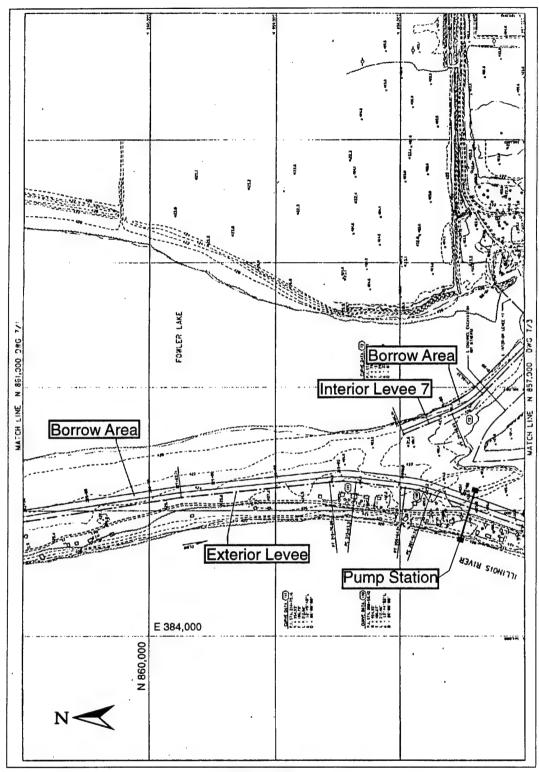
Stump Lake Complex HREP/EMP project area plan, N857,000-N861,000.
